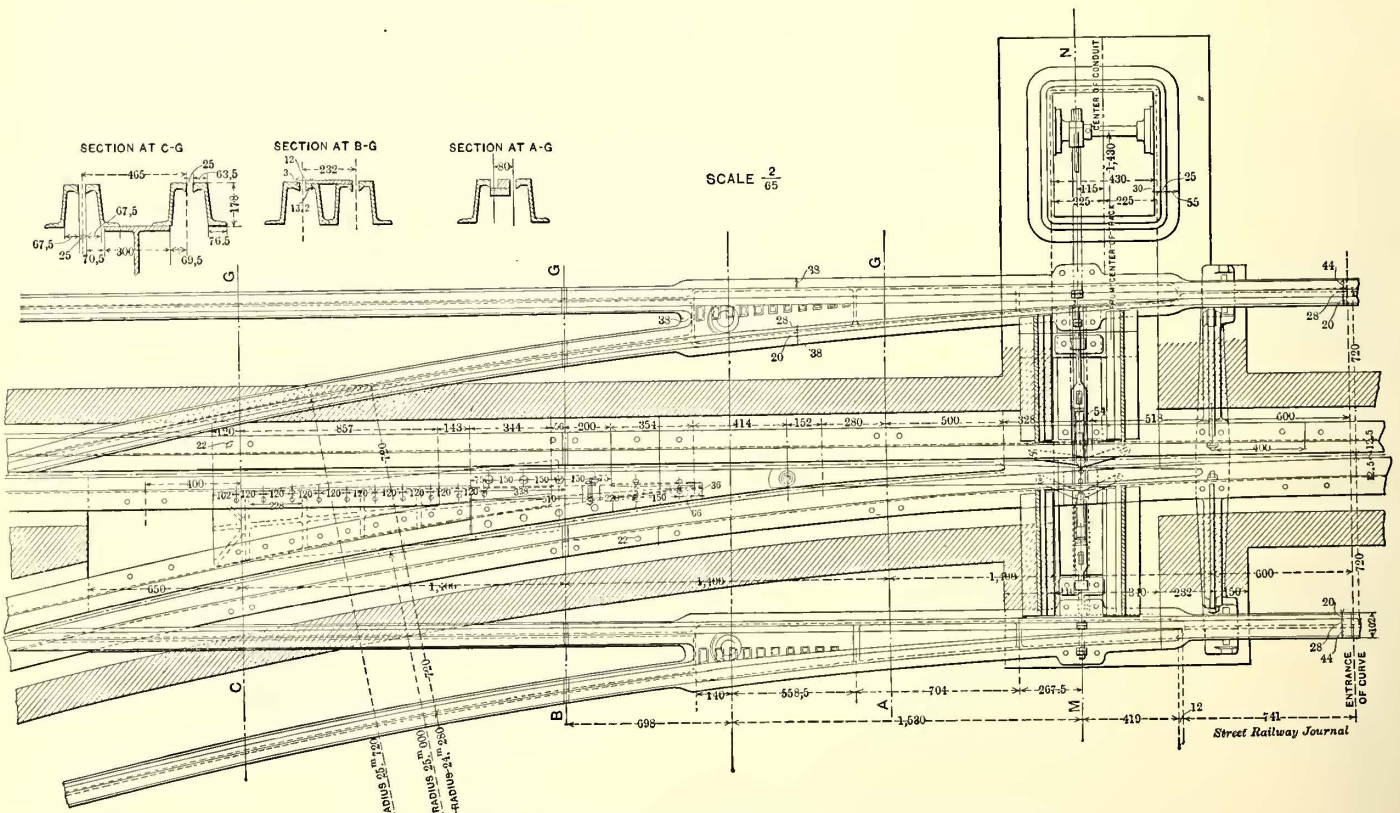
SWITCH MECHANISM, WITH SLOT IN CENTER OF TRACK
